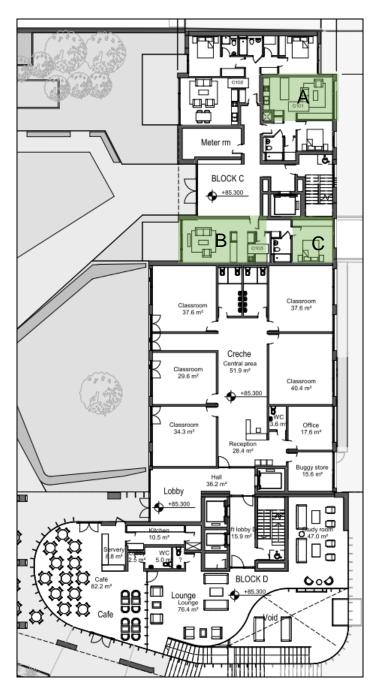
Level 1 Boulevard Ground Floor Block C and D Assessed Rooms (Source: HJL Drawing No. SFC-HJL-00-01-DR-A-1011)
